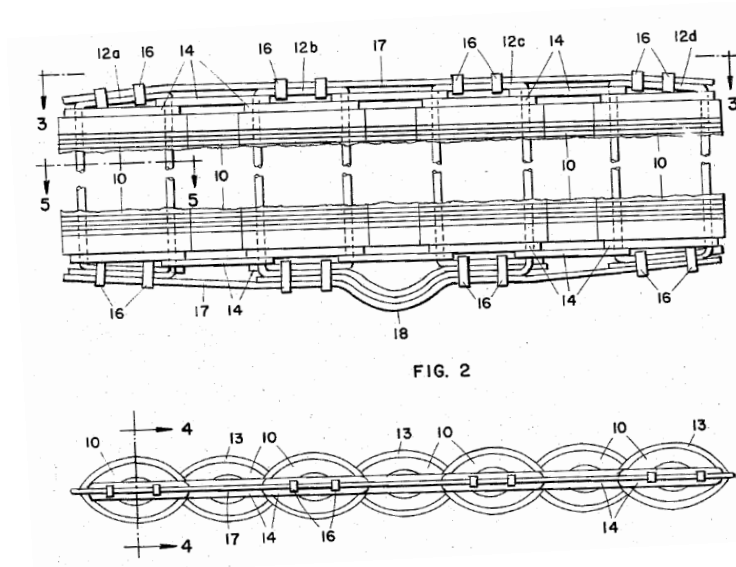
Belanger Mat Profile and Side View (Belanger)
